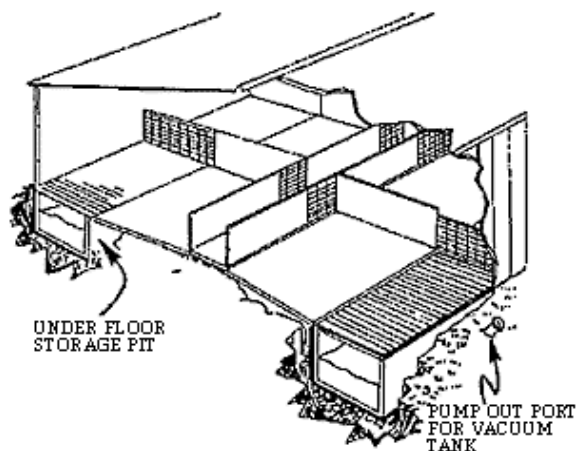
Confinement building with partially slotted floors and underfloor pit storage.
